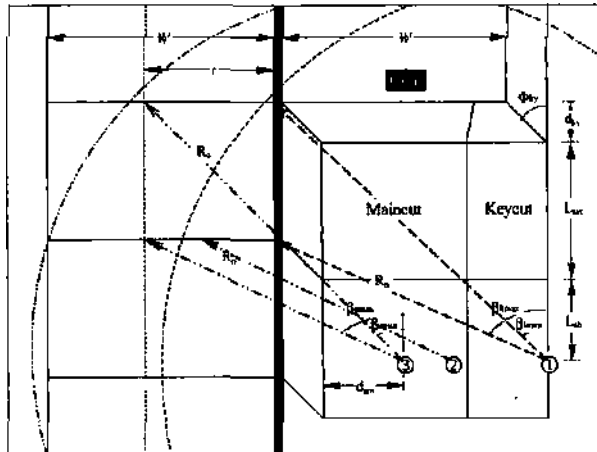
Dimensions on the highwall side in the DND spoiling pattern (level coal seam).
